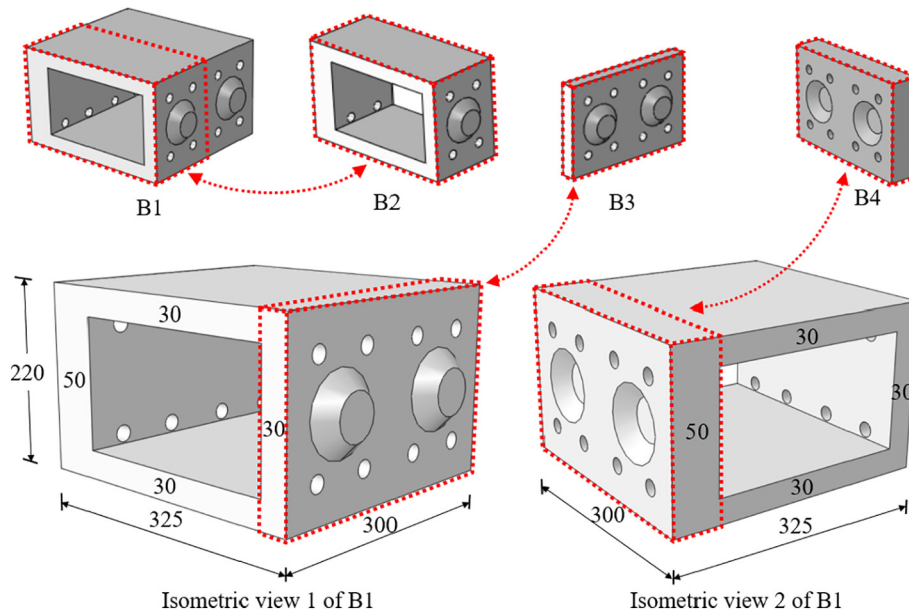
Illustration of a set of four Lego-inspired blocks (RecoBlox™): (a) B1 (full block), (b) B2 (half block), (c) B3 (male plate), and (d) B4 (female plate). The blocks have shear keys and holes for passing bolts to joint multiple blocks. Dimensions are in mm.
